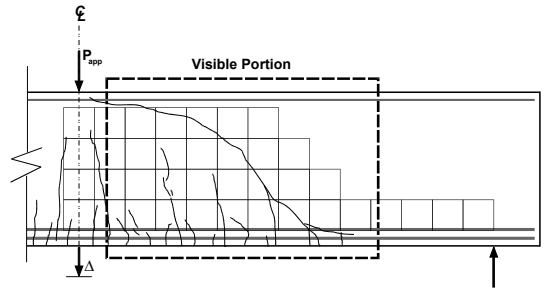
Progression of Failure Crack in Specimen SB-40-N-1
